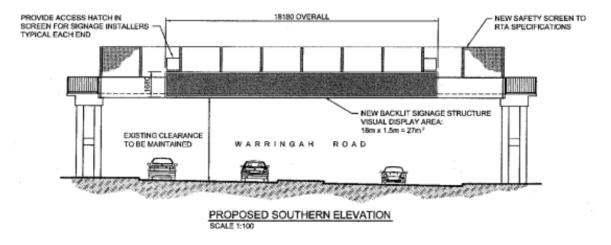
Stamped Plans – southern elevation (Source: DPHI)
